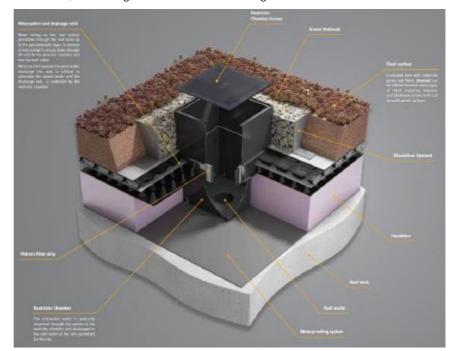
Typical blue roof construction (indicated with a living roof finish) (Source ABG Roofing Ltd)
